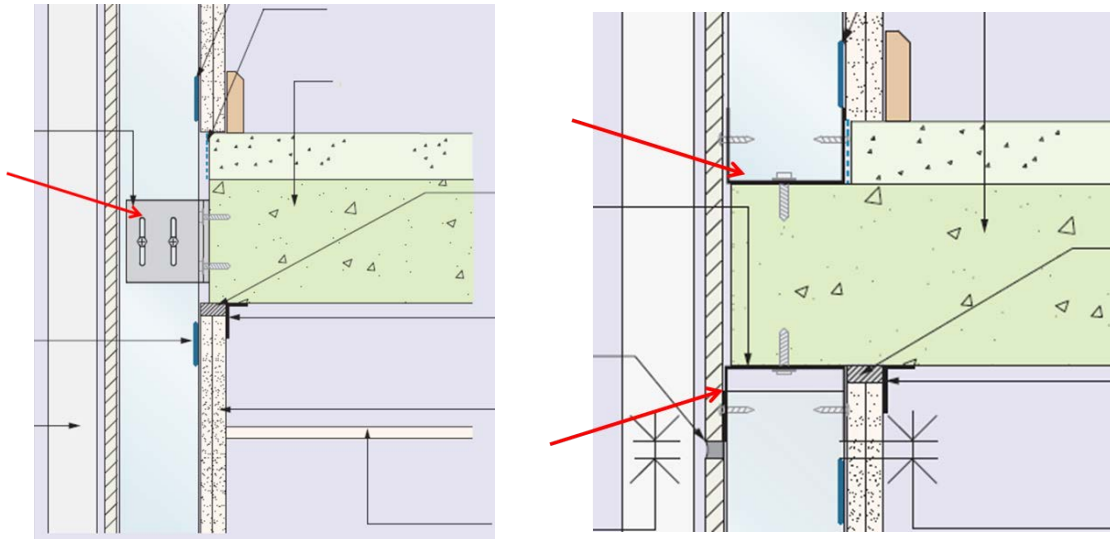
Primary brackets connecting framing members to the structure (©Metsec)
